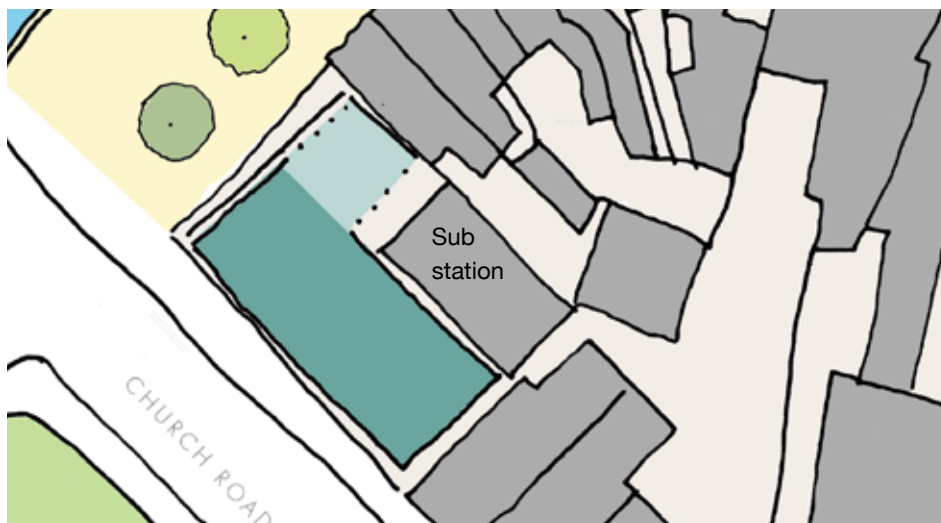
A sketch showing a plan for a new building on the corner of Church Road, wrapping around the existing substation and addressing both Church Road and the new public space on Church Street. The darker blue indicates the location of the new building and the lighter blue shows the location of the arch and access to the sub station at ground floor, which the building will extend above.
